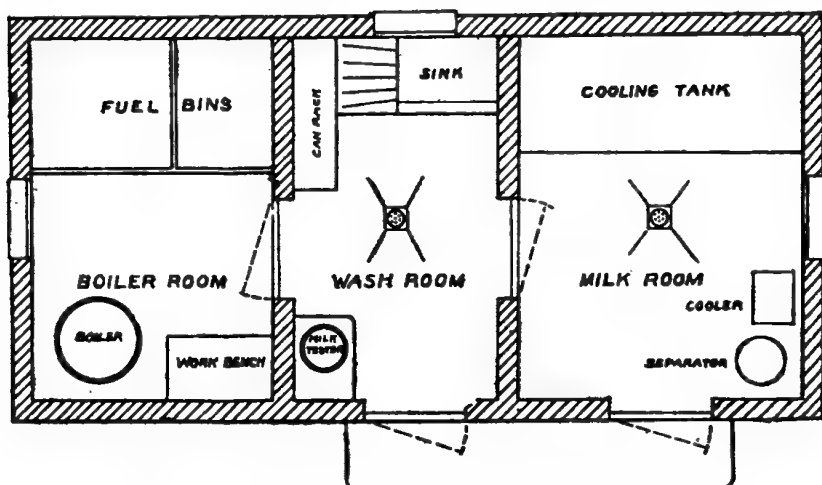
Plan of a milk house for a medium size dairy farm. Dimensions 10 feet by 8 feet 6 inches high in front and 6 feet 6 inches in rear. Outside covering should be building paper and sheathing or weatherboarding.
